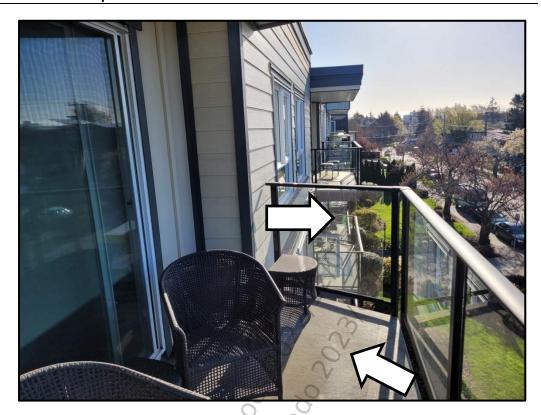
(B10 10 04) - Balconies, Showing Vinyl Waterproofing Membrane and Railings
